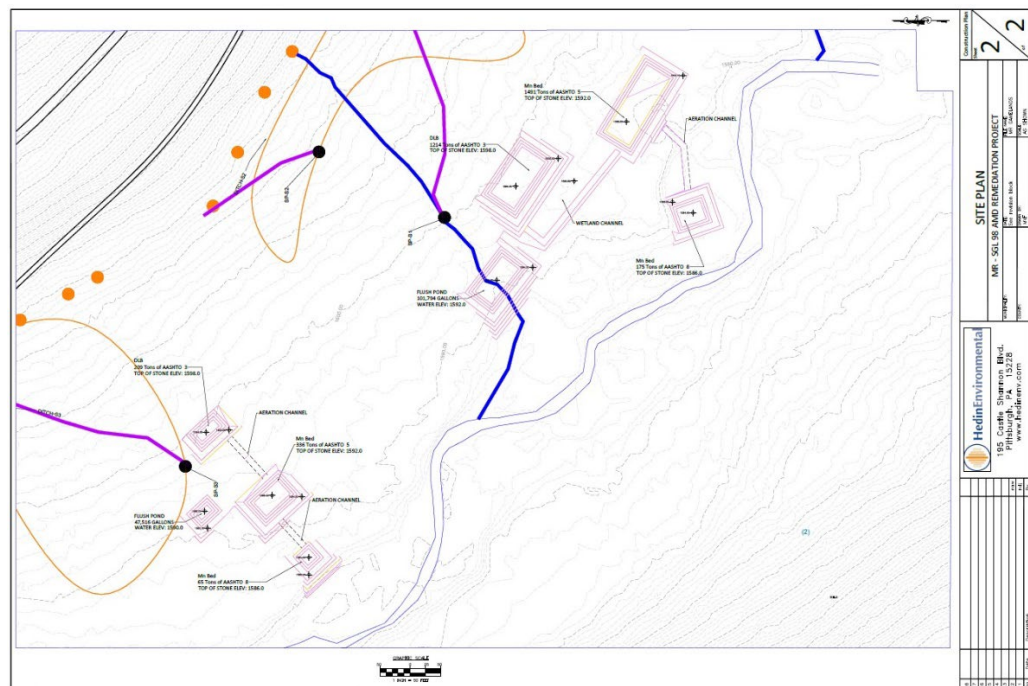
MRSGL98 South Treatment Systems Conceptual Site Plan
